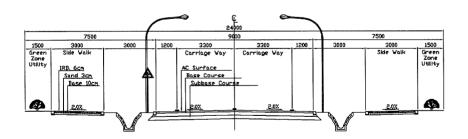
Typical Cross Section for Radial Road Segment-2 (for ML6)
